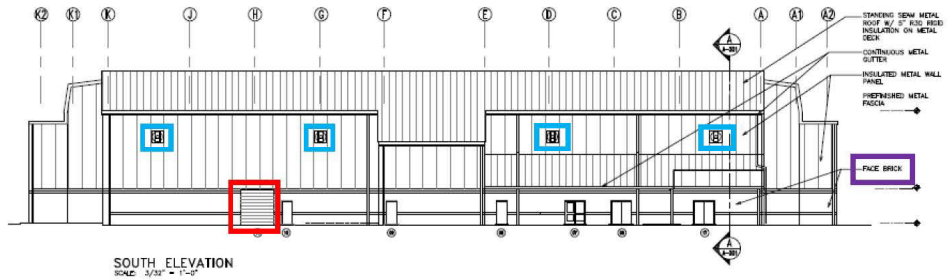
Image showing the proposed configuration of the southeast elevation. All of the pedestrian doors would be single and double leaf with steel components, similar to those located on the current building. The one vertical roll-top door that would be installed left of the nose dock (indicated in red) would appear similar to a roll-top door being removed from the elevation on the right side of the nose dock (see Figure 10). Four vents would be added to the rear elevation, which are indicated in blue. The drawing note indicated in purple, which is shown on the 35 percent design plans, indicated that brick veneer would be installed; however, that design element has been removed to avoid impacts to the historic property.
